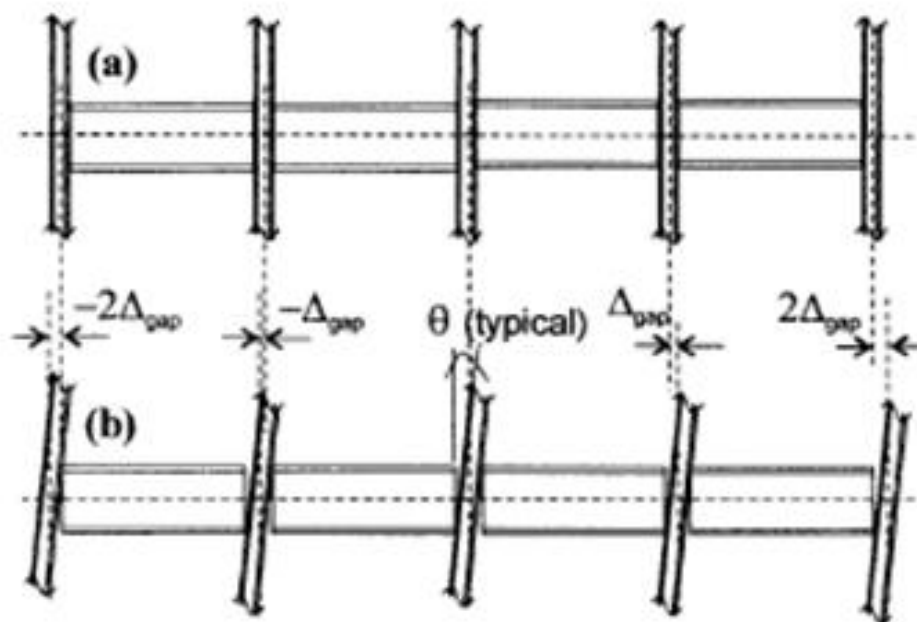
Elevation of one floor of a SC-MRF: (a) un-deformed (b) deformed shape (Garlock et al 2007)
